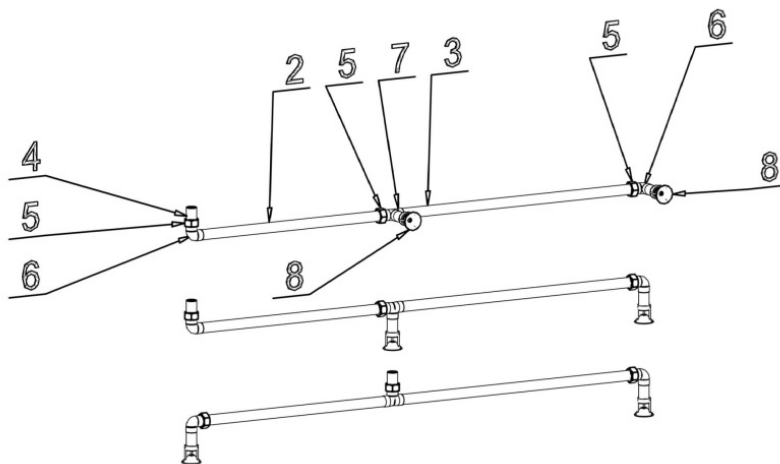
Examples of "Buran-7STT" pipes mounting.
